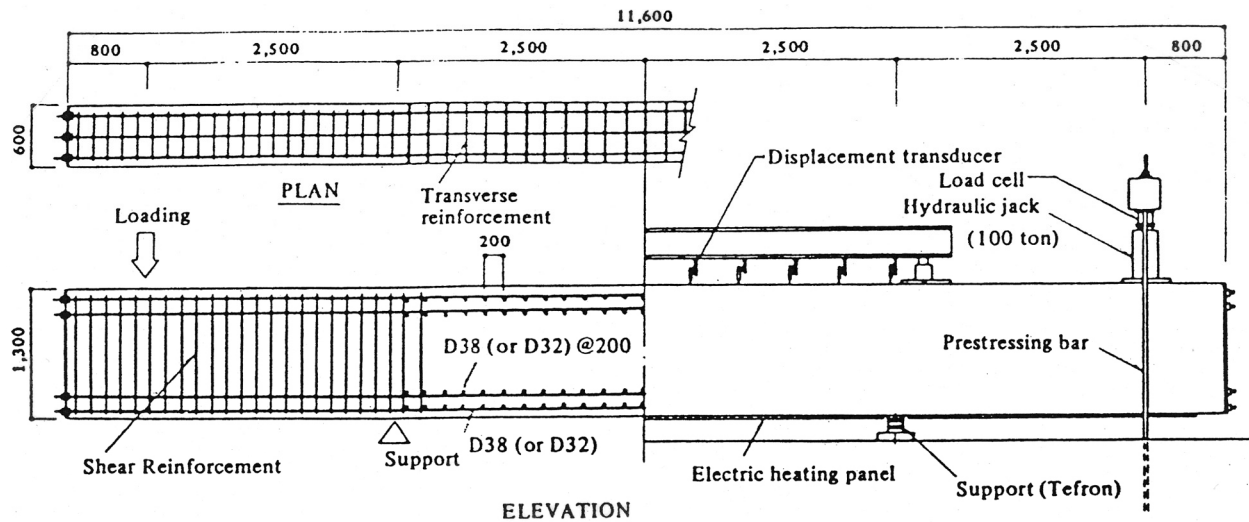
Reinforced concrete beam specimens tested to evaluate thermal cracking and thermal stress relaxation due to cracking. Source: N. Shibasaki et al., "Thermal Cracking and Thermal Stress Relaxation of Reinforced Concrete Member Tested by Full Sized Beam Specimens," Paper J4/2, Vol. J, *Trans. of 7th Intl. Conf. on St. Mech. in Reactor Technology*, p. 179–187, Chicago, Illinois, August 22–26, 1983.
